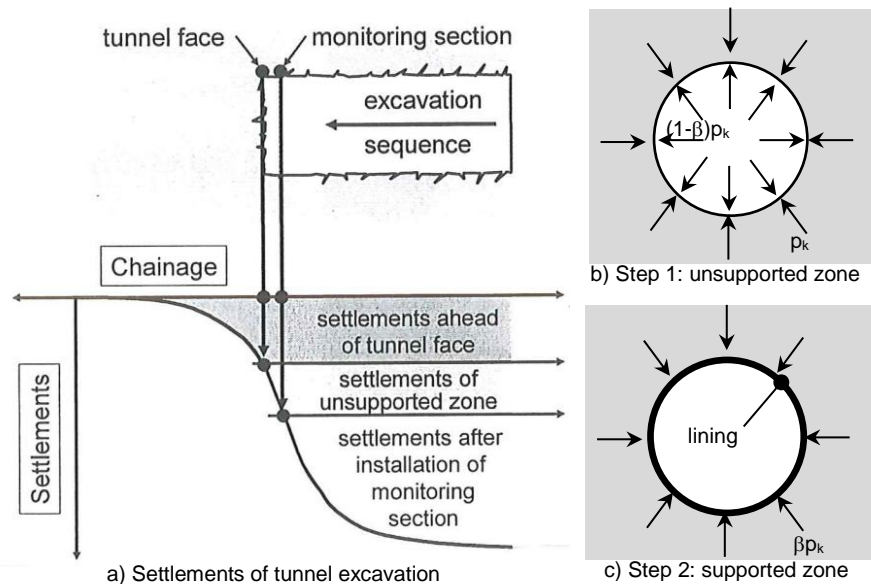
Settlement of tunnel crown with respect to chainage of excavation face
